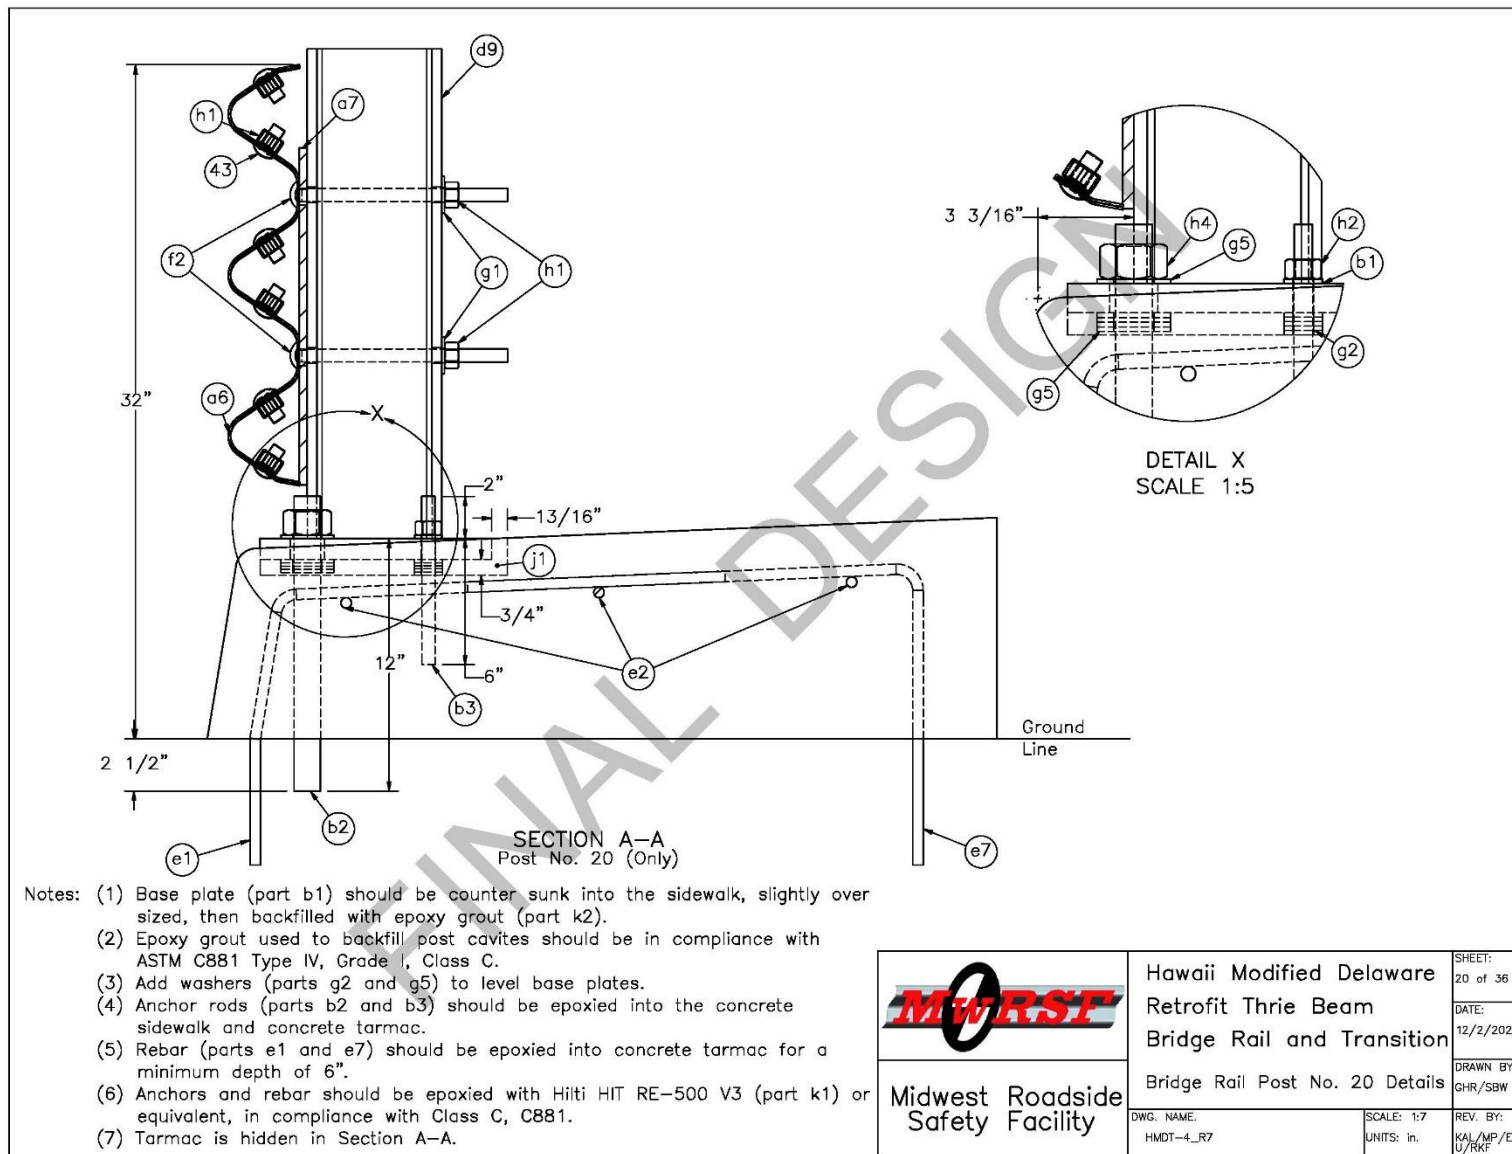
Bridge Rail Post No. 20 Details, Test No. HMDT-4
